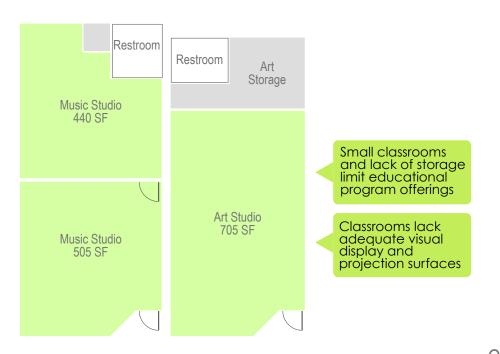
Existing Main Building, 2nd Floor Plan
